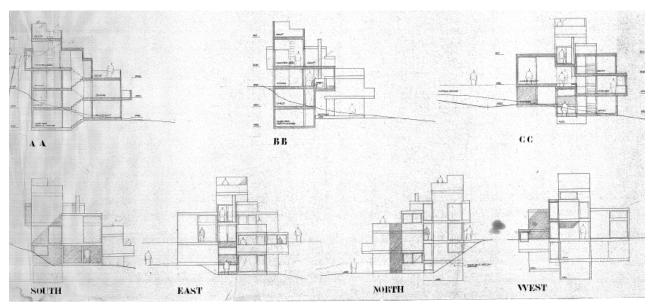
Wasserman House Section Drawings, John Fowler, 1963.
